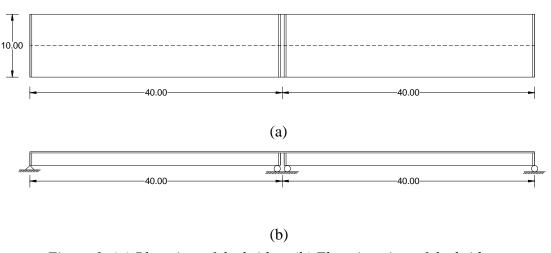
(a) Plan view of the bridge; (b) Elevation view of the bridge.
